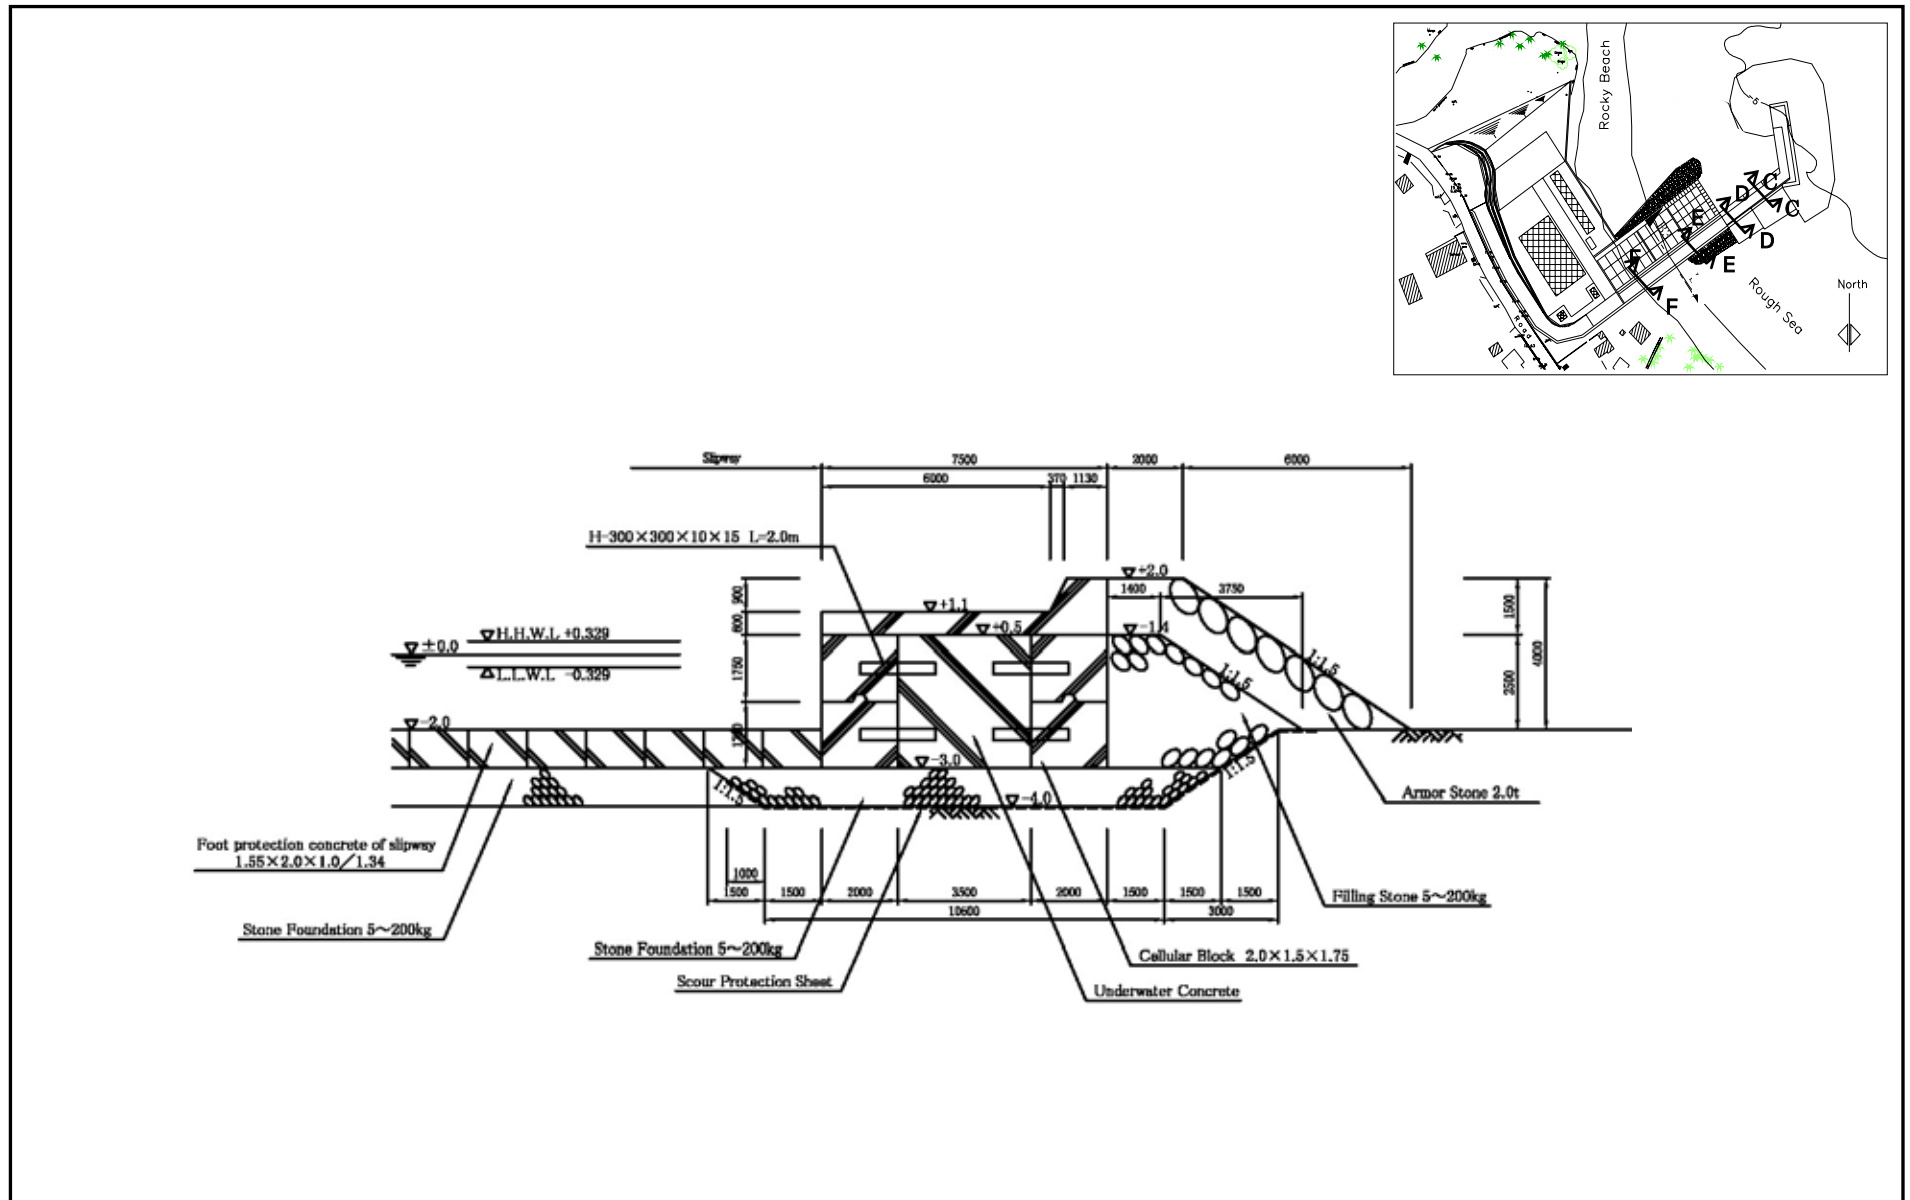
(6) Cross Section for Revetment (Section E-E)
